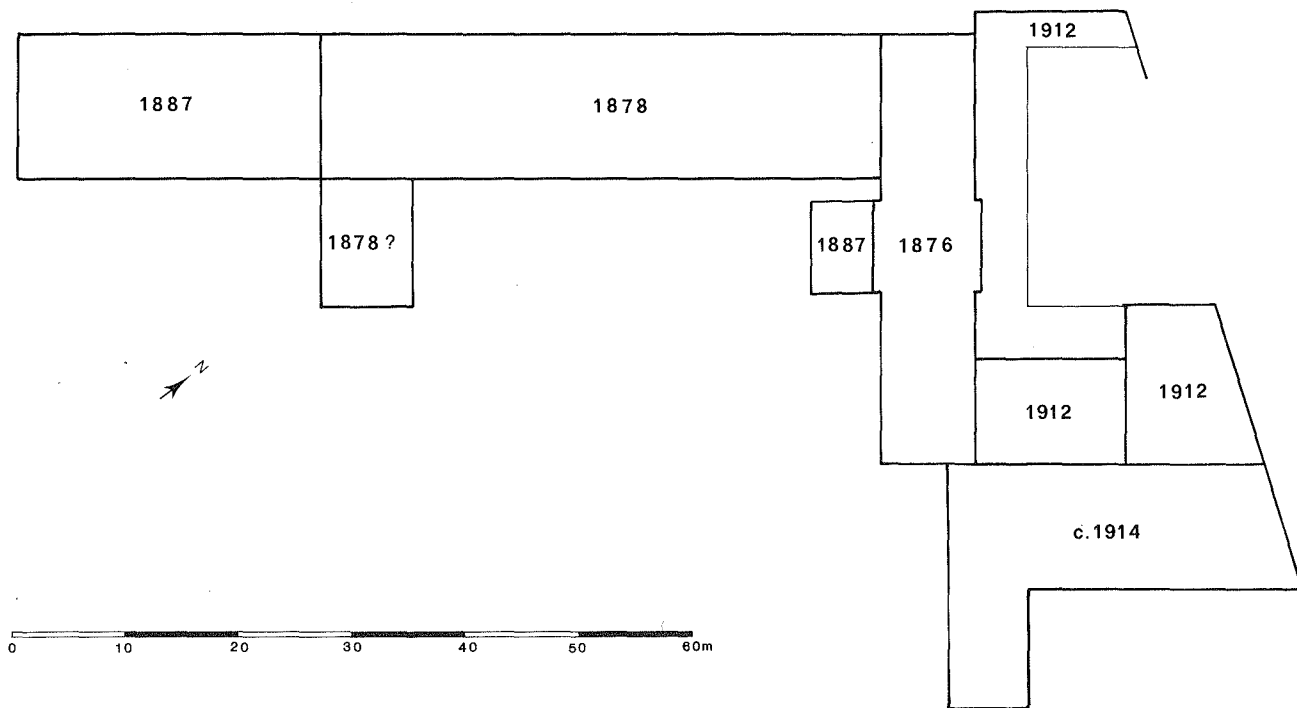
Plan of the Castlemaine Brewery showing construction dates.
